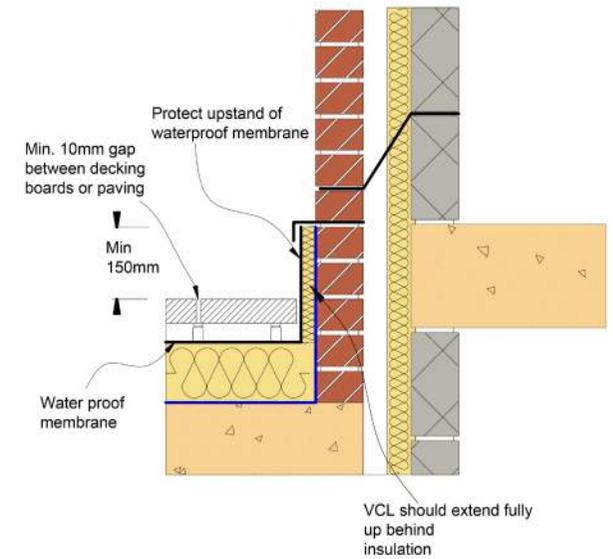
Details - Principles – Upstands to decking and paving finishes, (e.g. balcony parapet)
